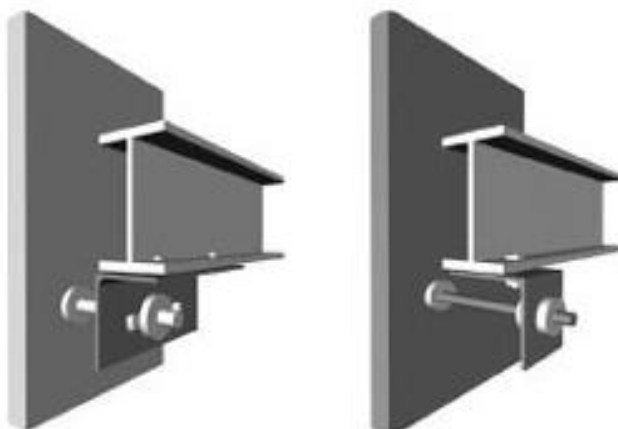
Horizontal panels suspended by pillars FO/00 (Ruredil. Construction chemicals and building technologies. “Fisis Earthquake-proof system for fixing panels”)
